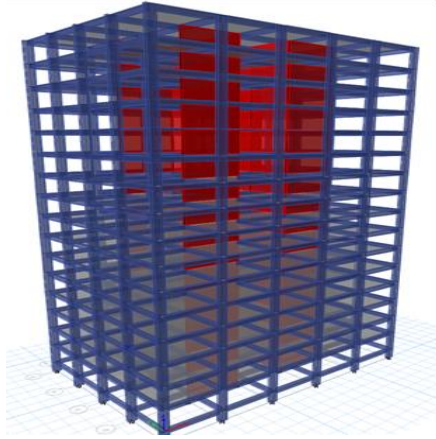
3D view of G+15 RC frame building with inner shear wall
